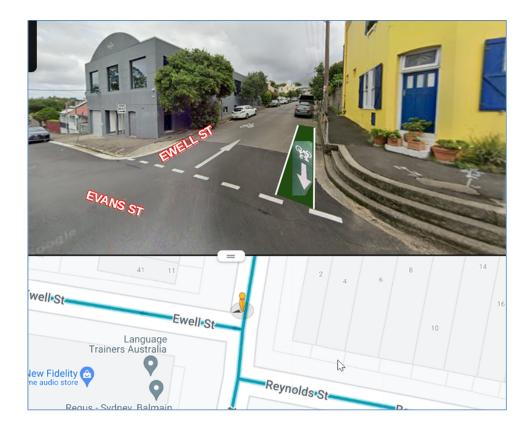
Proposed short separate cycle lane in Ewell Street near Evans Street.
